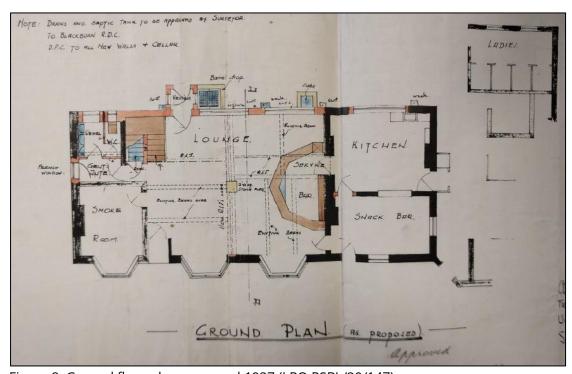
Ground floor plan proposed 1937 (LRO PSBL/20/147)
